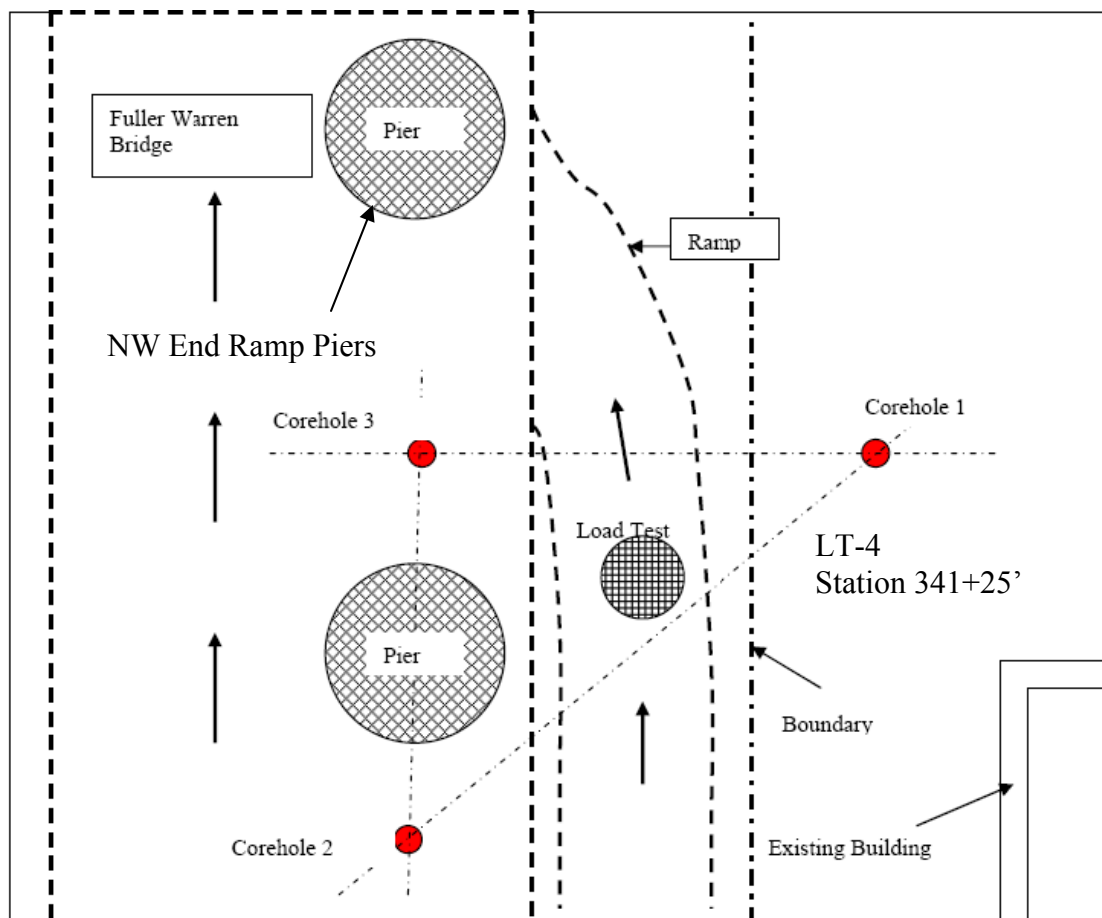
Corehole Layout with Respect to Bridge Pier and Load Test Location.
